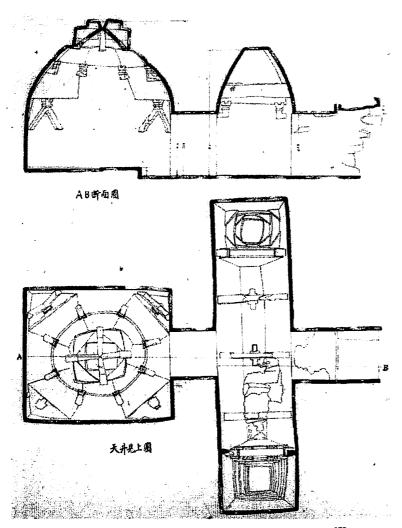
Tomb plan showing cross-section and ceilings<sup>179</sup>
